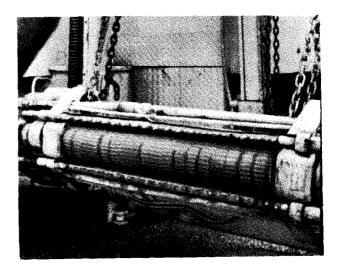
View of grooving truck with cutter in place for a transverse cut under the truck
